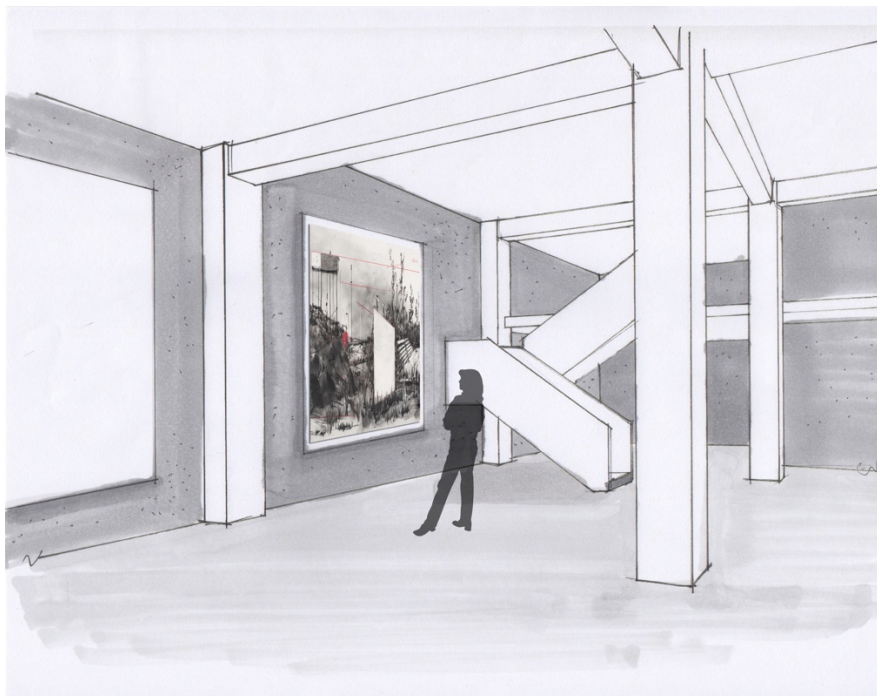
Conceptual sketch of gallery space looking towards the mezzanine.
